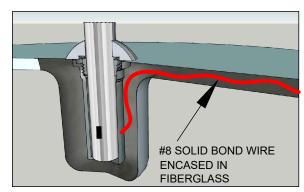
DETAIL REFLECTS ANCHOR INSTALLATION IN NESPA SHELLS ONLY.
